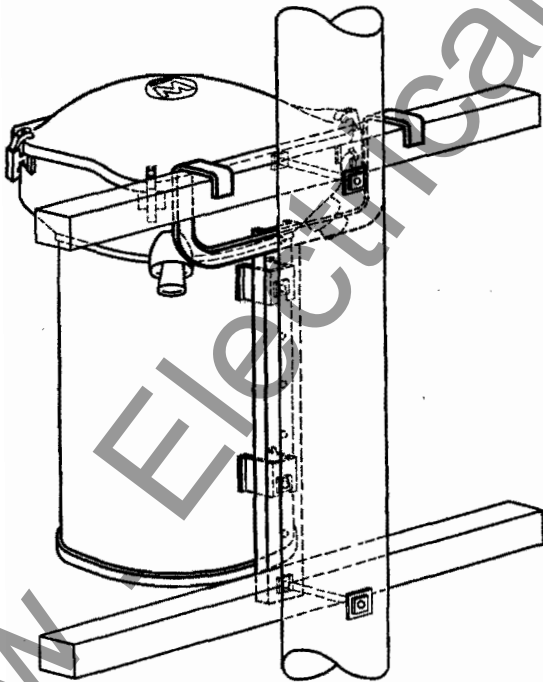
TRANSFORMER MOUNTING USING "T CROSSARM HANGER".
